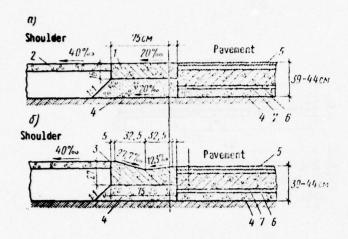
Reinforcement of shoulders and edges of the road surfacing: 1-with concrete slabs; b-with prefabricated concrete gutters; 1-concrete slab; 2-reinforcement of the shoulder with crushed stone, with a layer h=8 cm; 3-prefabricated concrete gutter; 4-crushed stone base; 5-two-layered asphalt-concrete pavement h=8 cm; 6-monolithic cement-concrete h = 18 cm; 7-smoothed out sandy layer h = 3-5 cm.
